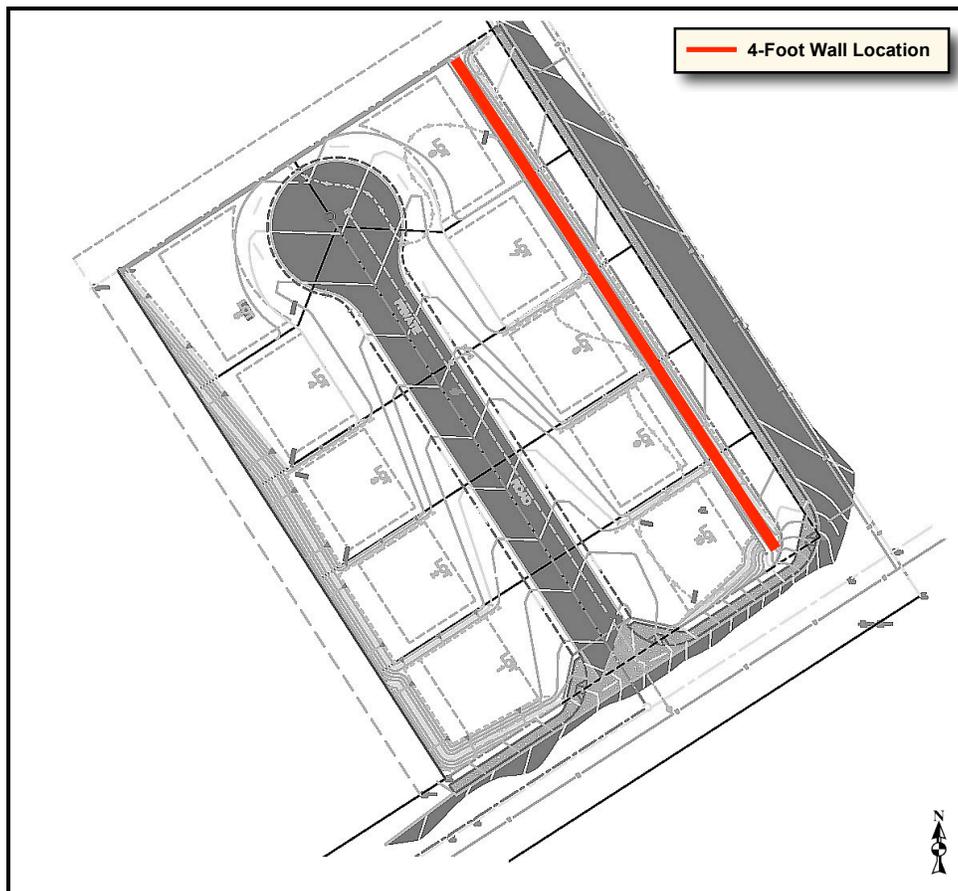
Proposed Mitigation Plan – Ramona 10-Lot Subdivision (ISE 5/07)
